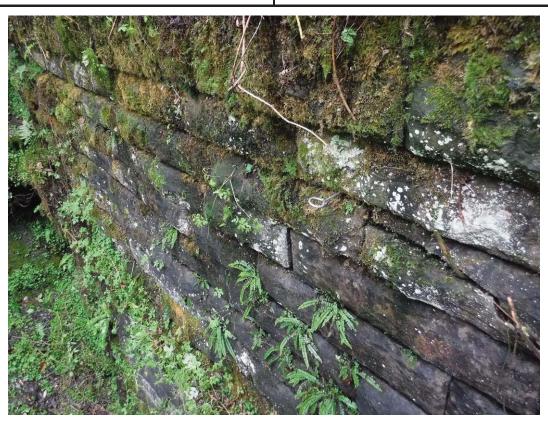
Northeast Portal, Stonework, loose blocks and open joints, depth 3" to 12" where blocks not tight or pointed, area 40sq.m., light.
